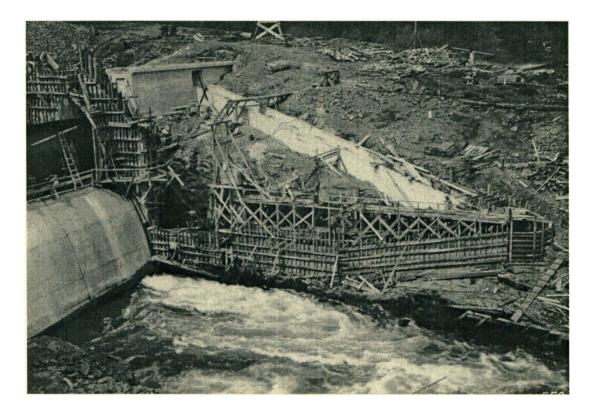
Fish ladder at Easton Dam under construction, 14 September 1929. (Source--NADC)
